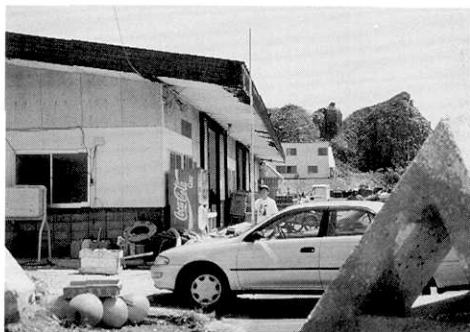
Sea water climbed up to the edge of the roof of the building of the fishermen's cooperative at Kamiura Port in Taisei Town. Notice that the edge of the roof is partially damaged due to the tsunami.
